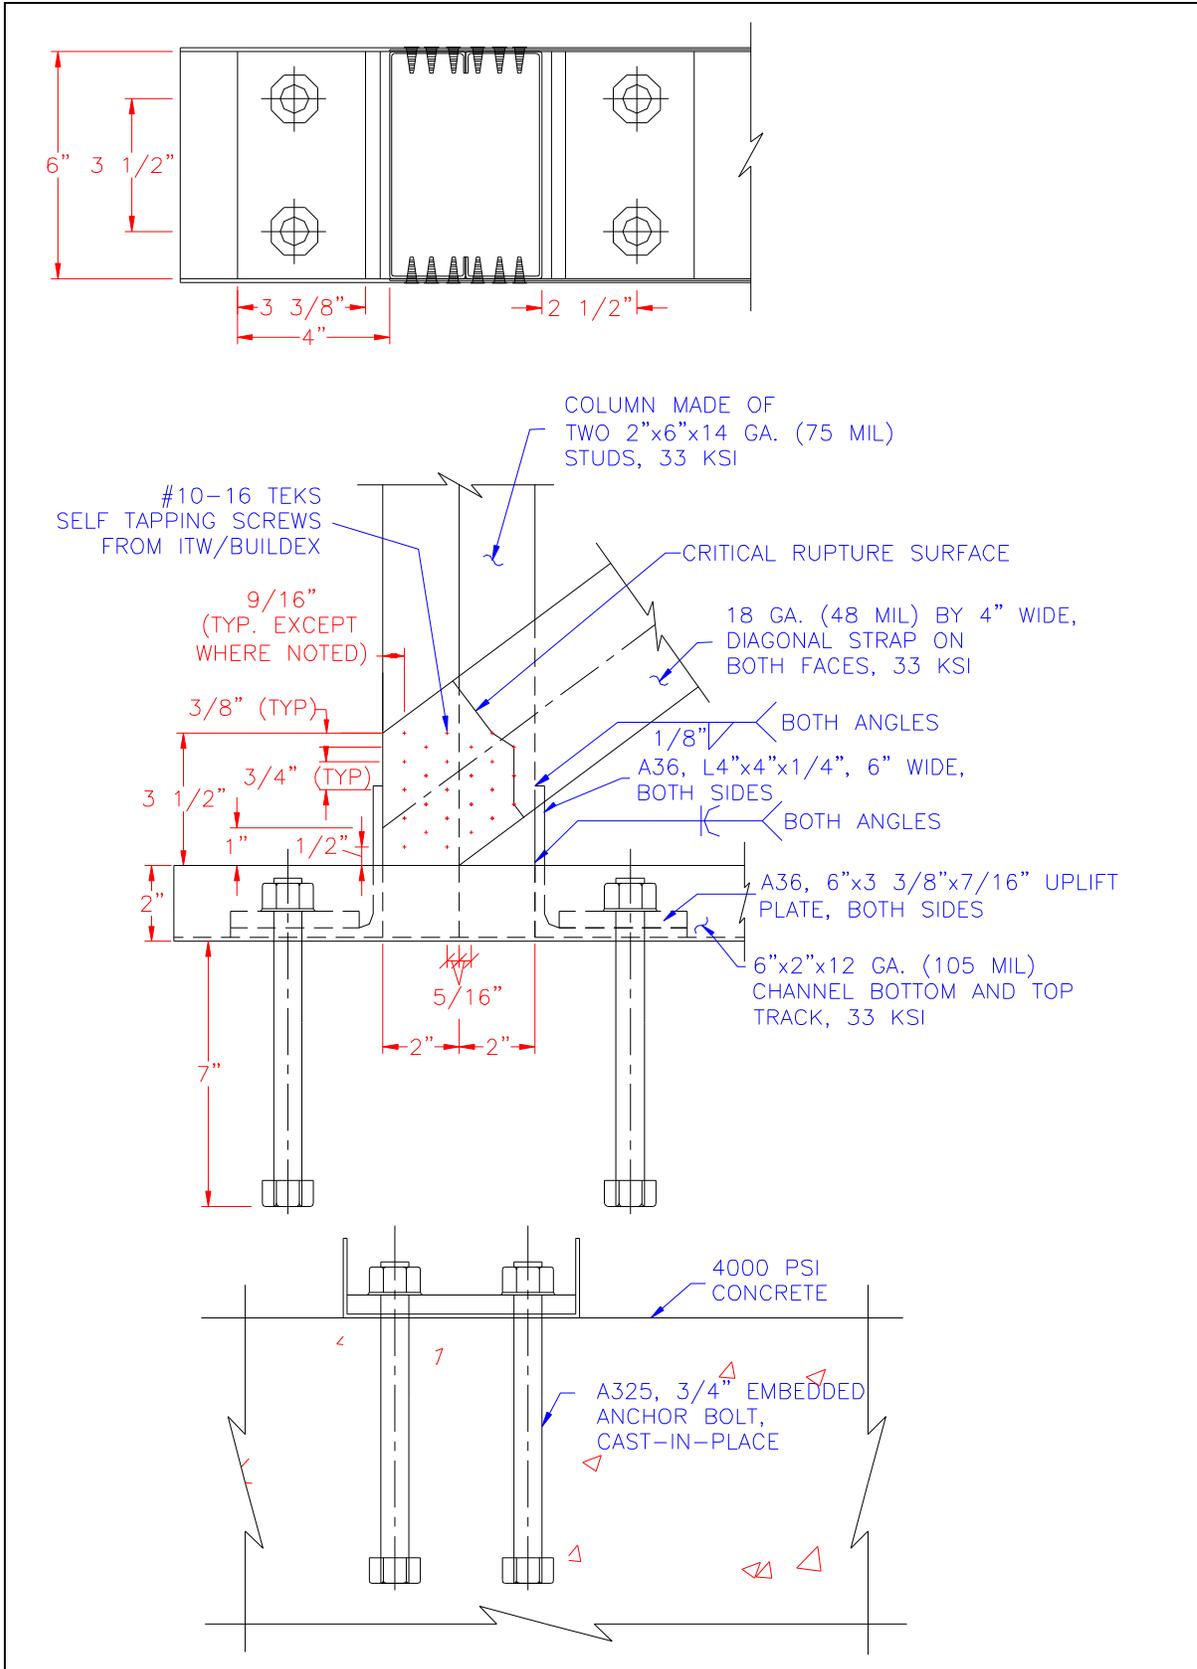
Example connection/anchorage detail – 2nd row of Tables D-5, D-8 - D-17.
